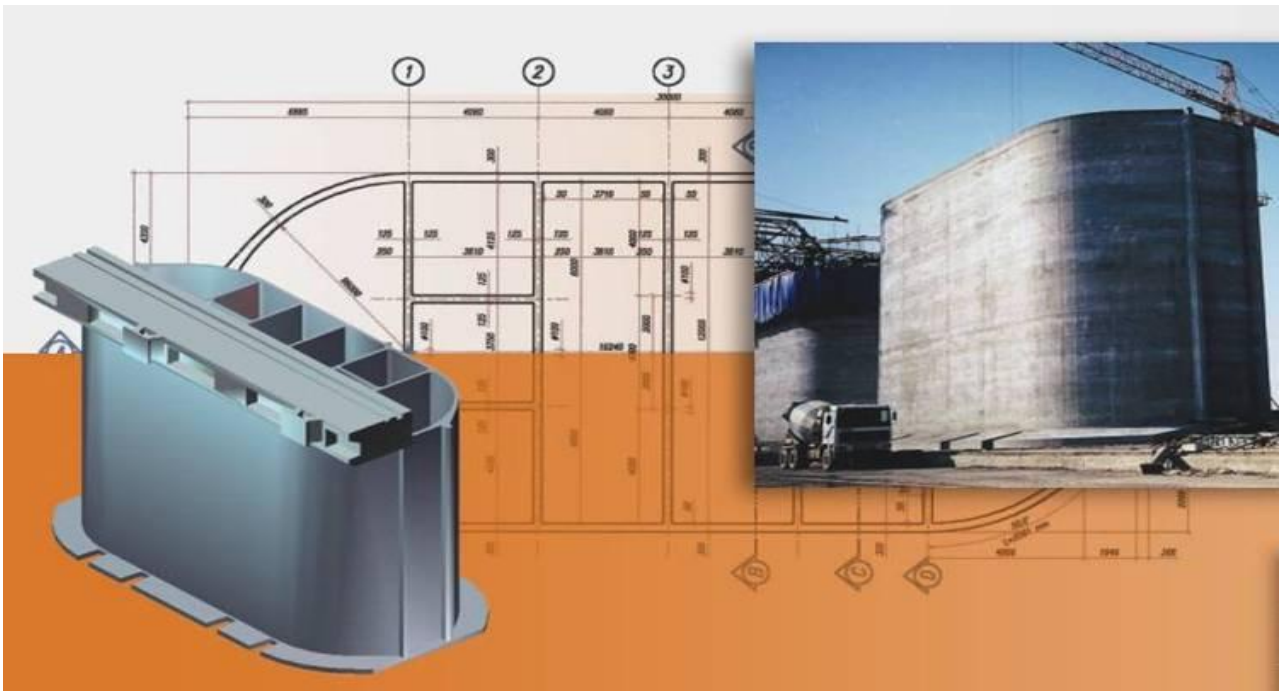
Plan drawing of the Belde Port Caisson, on the left the scaled Model of the Caisson and Capping Beam, and on the right the Caisson Construction stage
